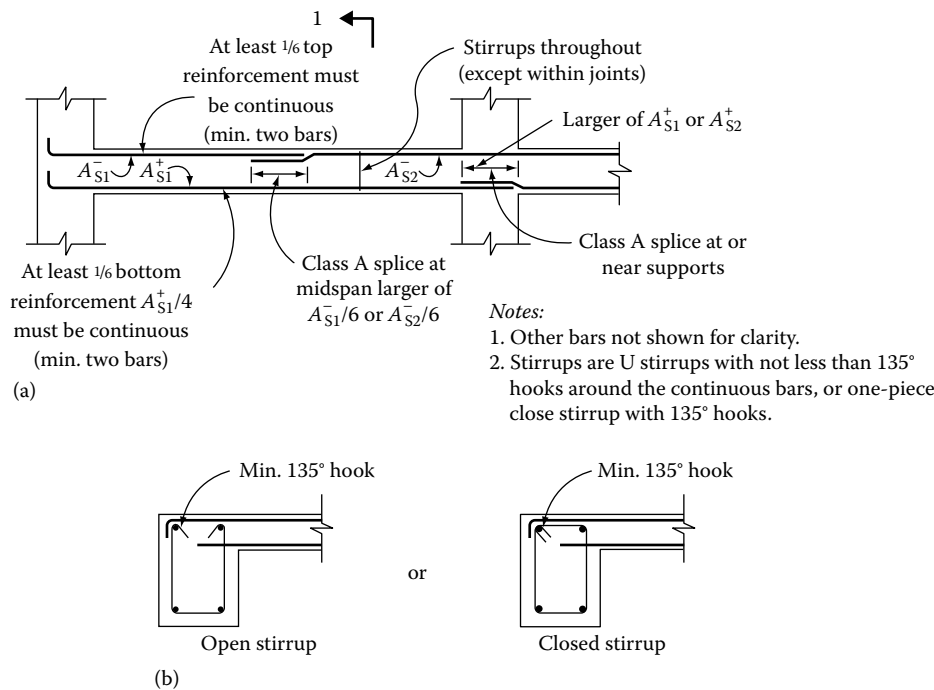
Integrity reinforcement in perimeter beams: (a) perimeter beam elevation and (b) Section 1.
